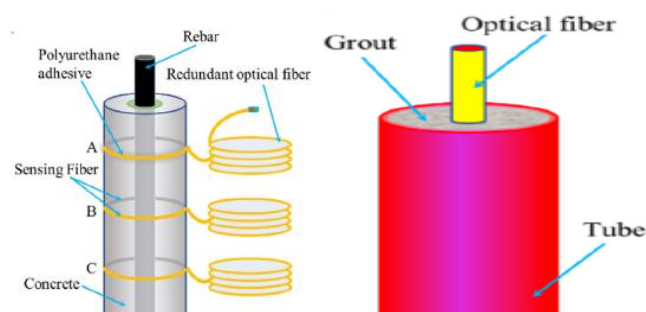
Brillouin backscattering sensors: (Left) OF wrapped around cylindrical column, (Right) OF encased grout [21]
